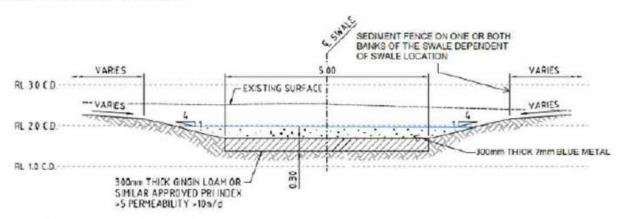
Arrangement of drainage retention swale at Berth 1, (Ref. P100184-5100-Cl-1060 Rev B)
